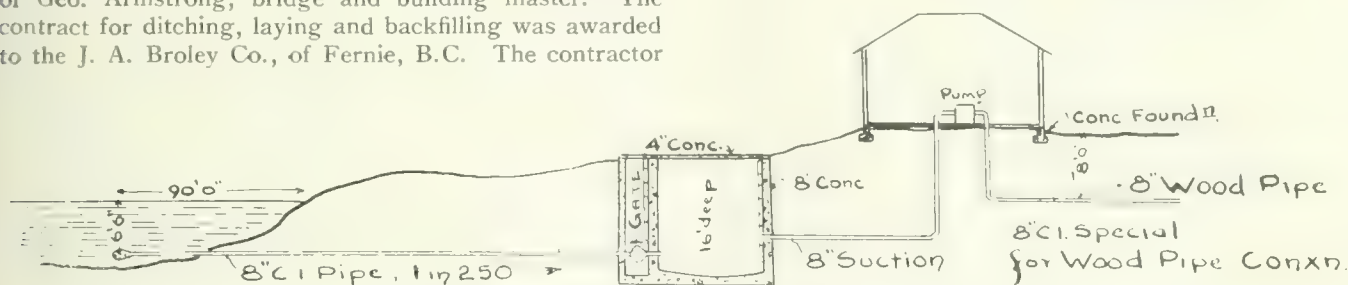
Section Showing General Arrangement of Plant and Piping.
